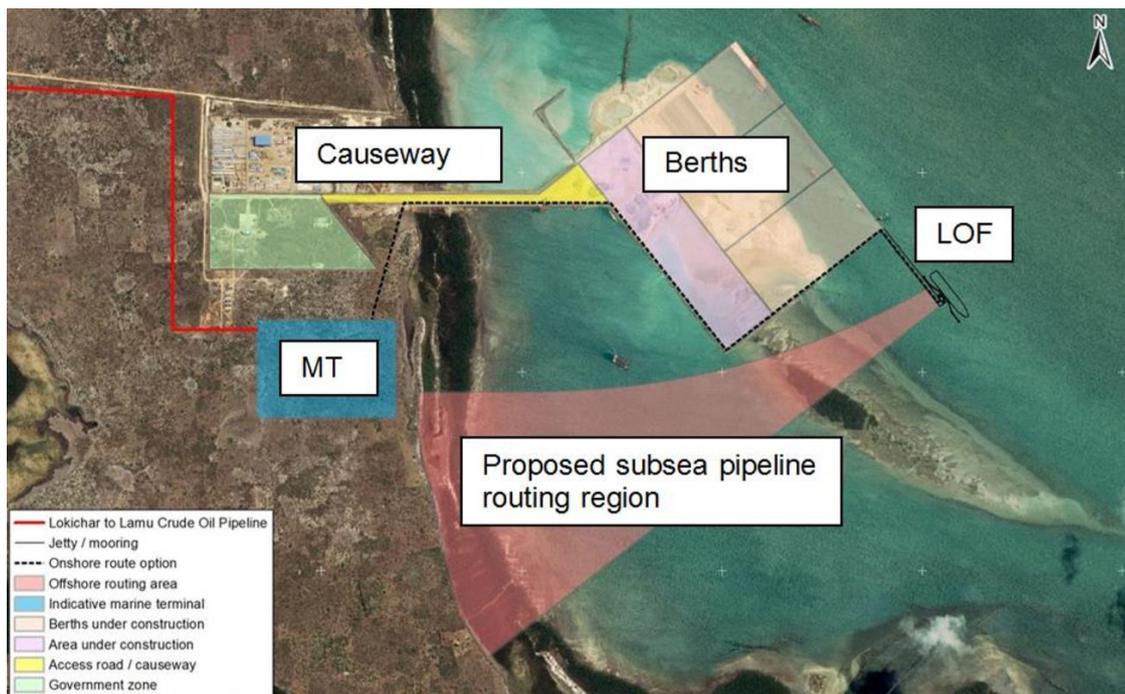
Proposed Layout Options for the LLCOP at Lamu Port.
